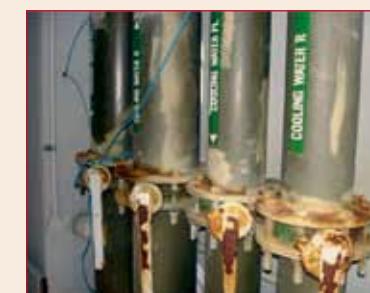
Failure of paint coatings on steel piping and fittings in building services plant room.
